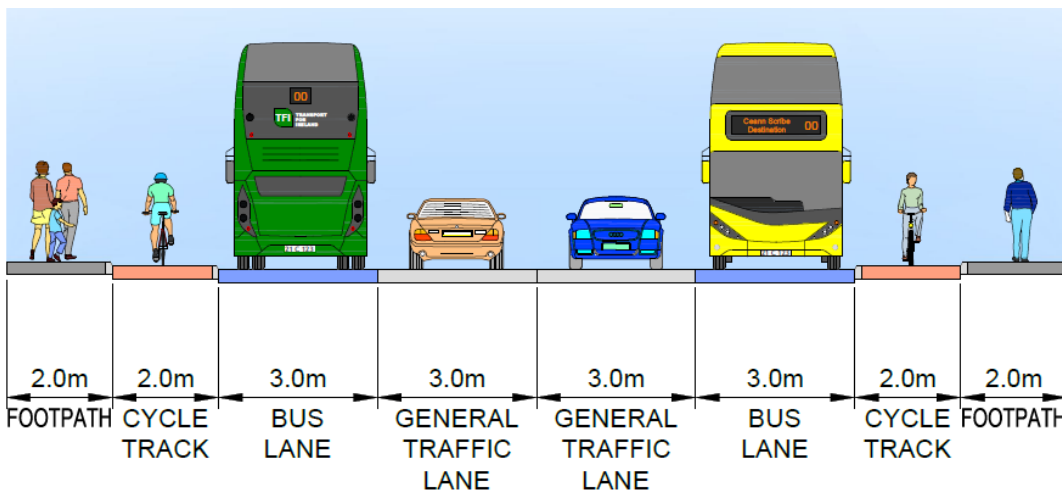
Section 2, Proposed Option 3 – Cross Section A-A
